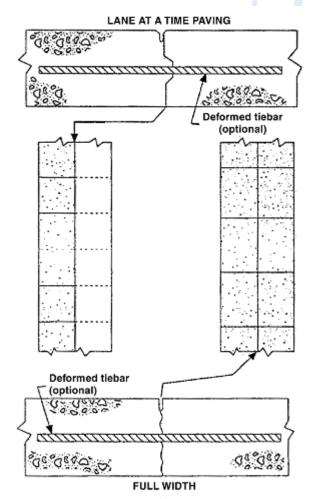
Longitudinal joints.³³ (Note: use butt joint with tie bar for pavements 150 mm [6 in.] thick or less.)
